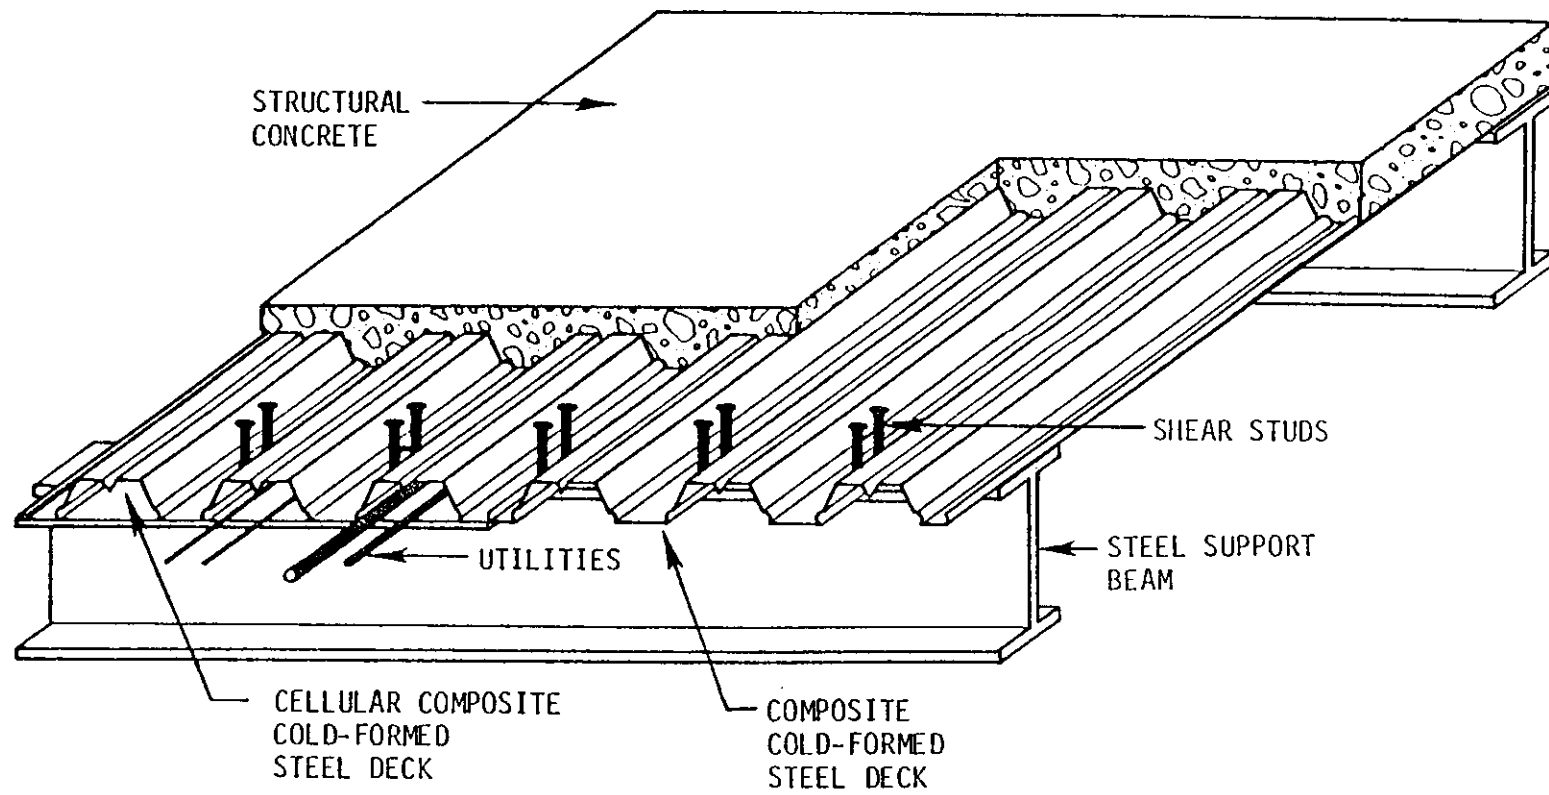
Typical construction utilizing cold-formed steel decking with composite support beams (30)
